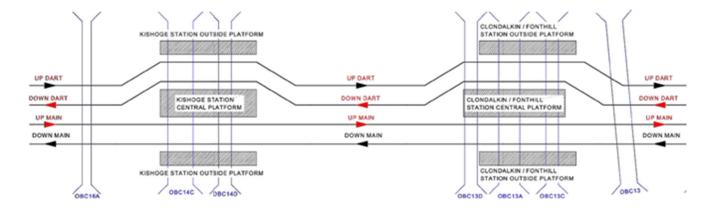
Typical platform arrangement at Clondalkin / Fonthill station
